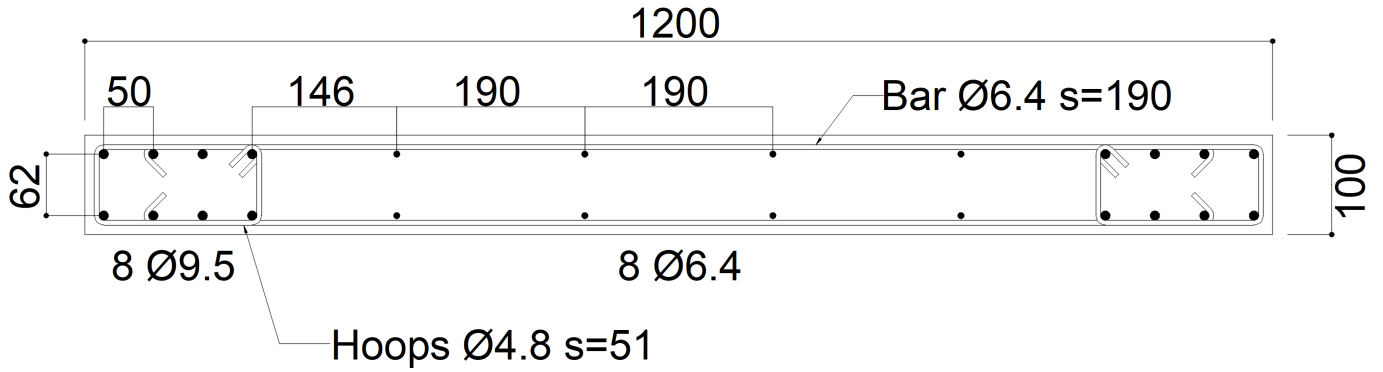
RW2: Cross section and reinforcement detailing [Unit: mm].
